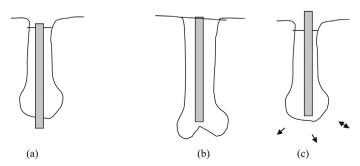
Failure mechanisms of augercast piles. (a) Pile penetrates the grouted base and fails (punching failure). This is rare when a rebar cage is inserted. (b) Grouted base fails (splitting failure). (c) Bearing failure of soil.
